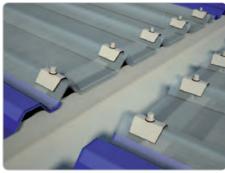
DETAIL OF OVERLAP Detail of double anchor bracket anchored to roofing structure
